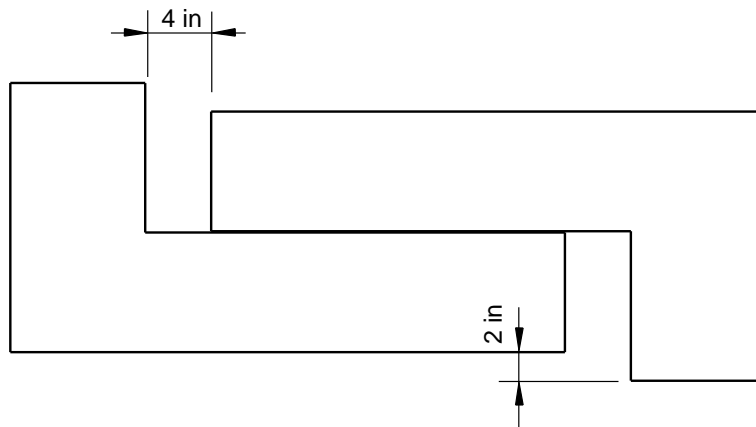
Dimensions of Joined Horizontal Shear Push-off Sections
